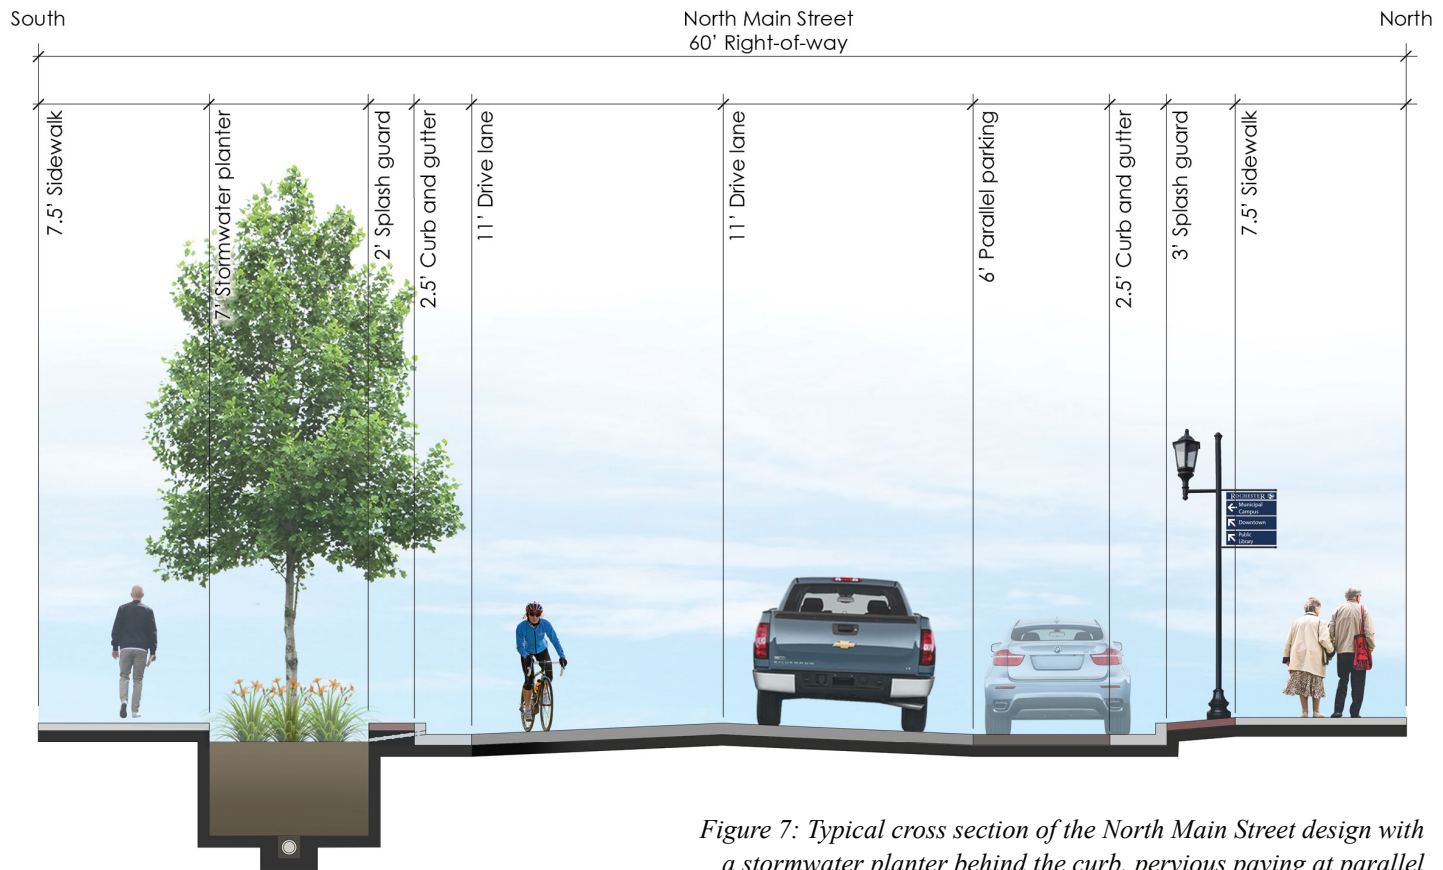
Typical cross section of the North Main Street design with a stormwater planter behind the curb, pervious paving at parallel parking spaces, a pervious paving splash guard behind the curb and historic street lights with directional signage.
